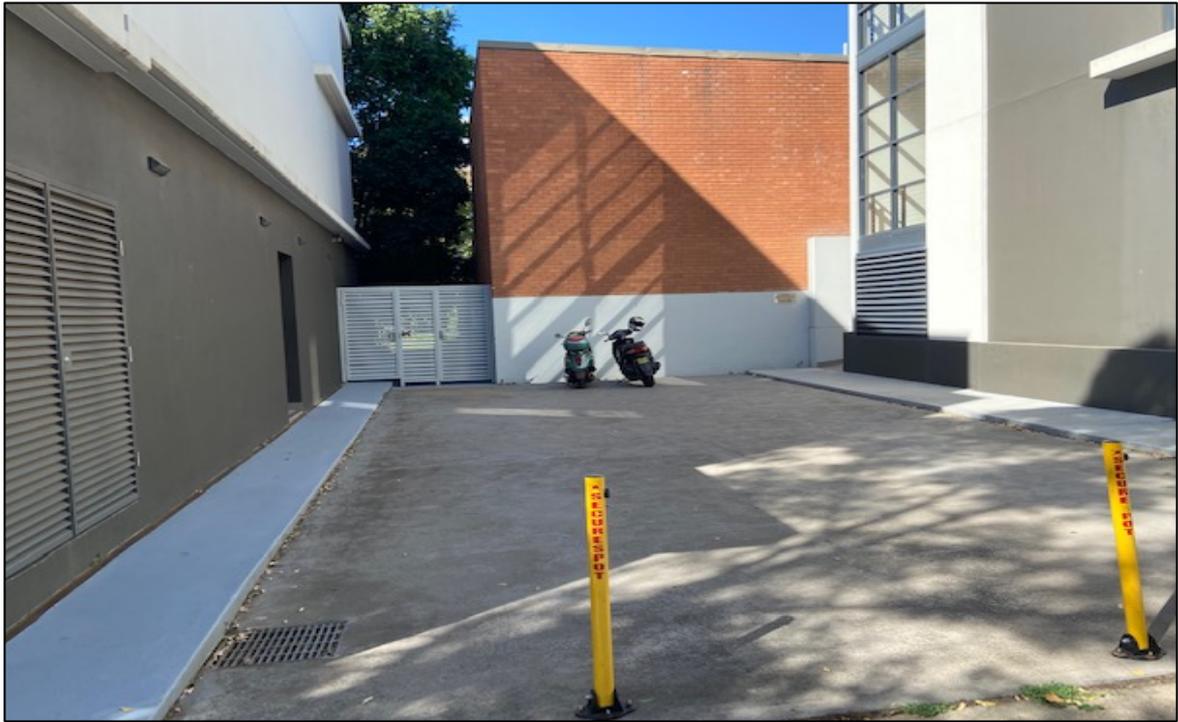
The right of carriageway located off Powell Street servicing the subject site
